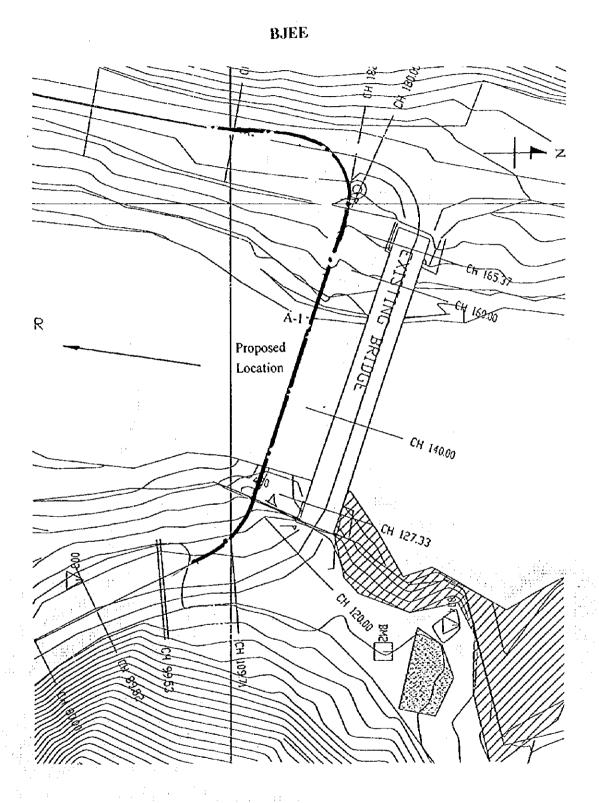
Plan of Alignment Alternatives for Bridge No. 3 Bjee (Not to scale)
